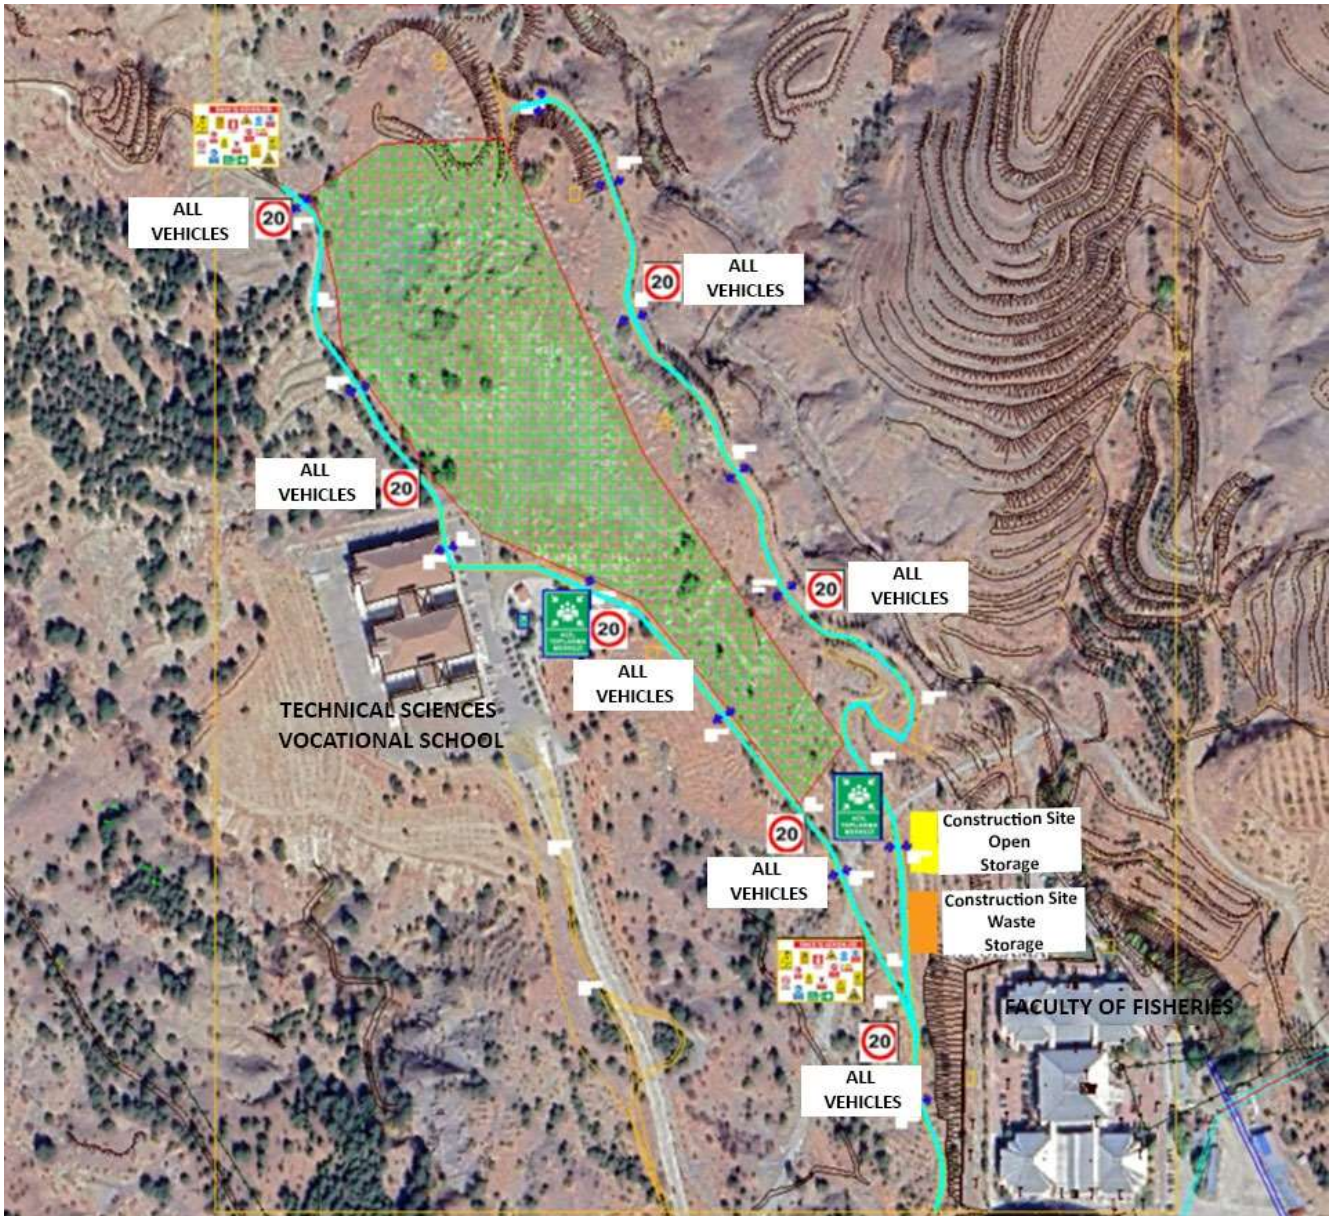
Site Traffic Plan for the Ground-Mounted Solar Power Plant
